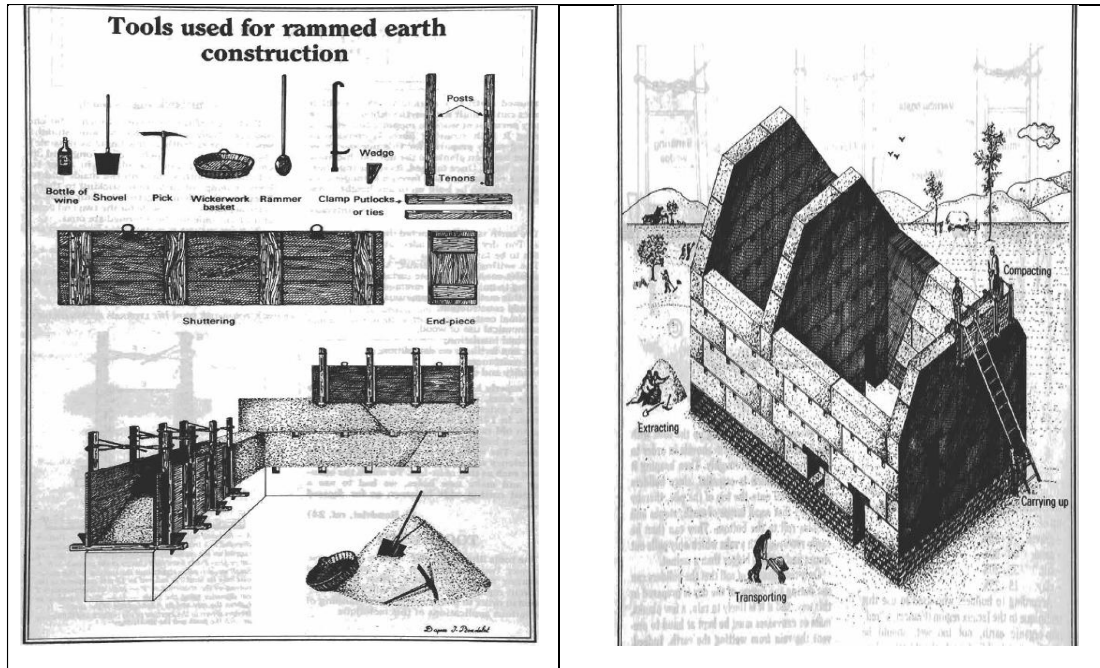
Tools used for rammed earth and rammed earth construction. source: Doat (1991)
